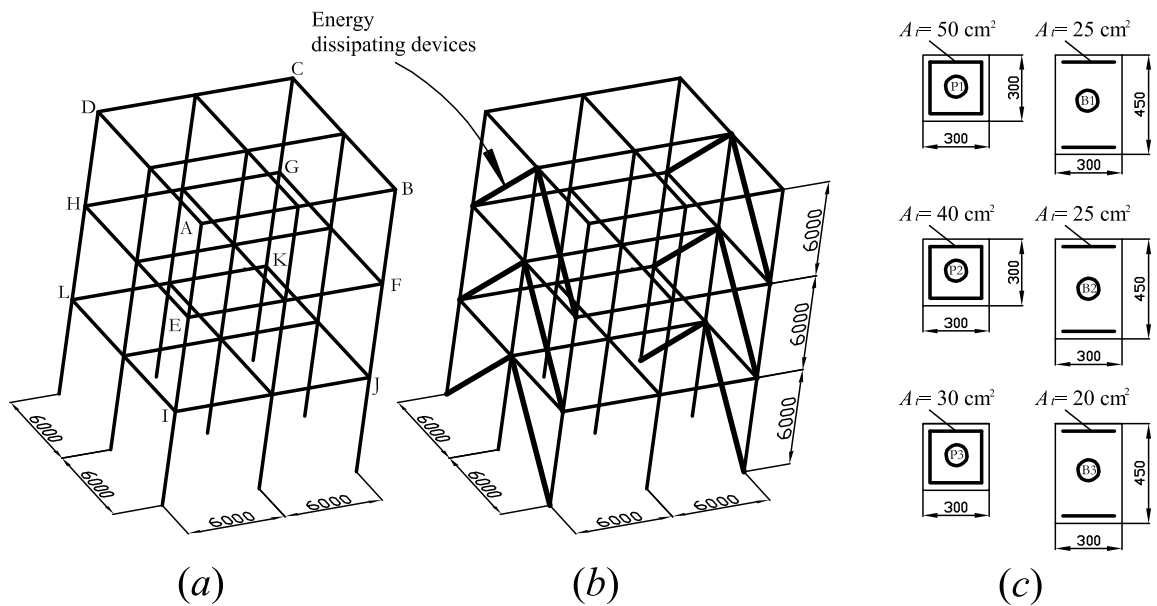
3-storey urban building. (a): Bare frame. (b): Structure with EDDs incorporated. (c): RC detailing.
